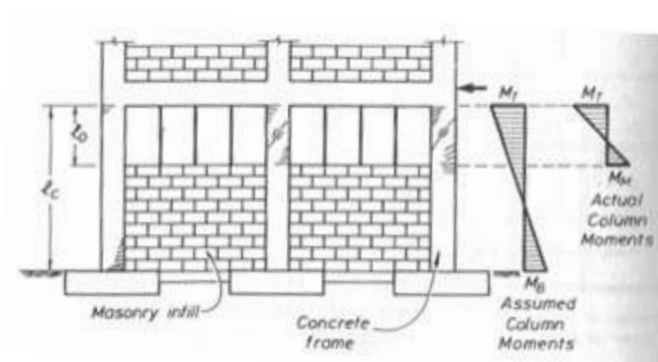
Partial masonry infill in concrete frames (Paulay 1992)
